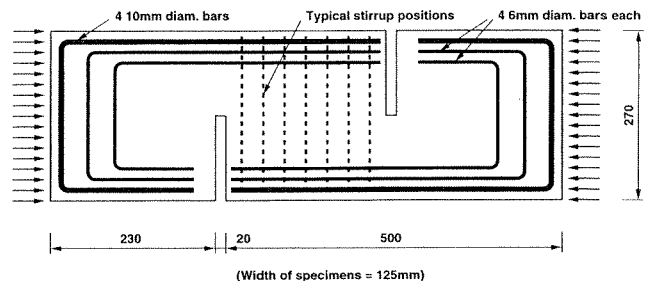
Schematic view of shear-block specimens used throughout all testing.
